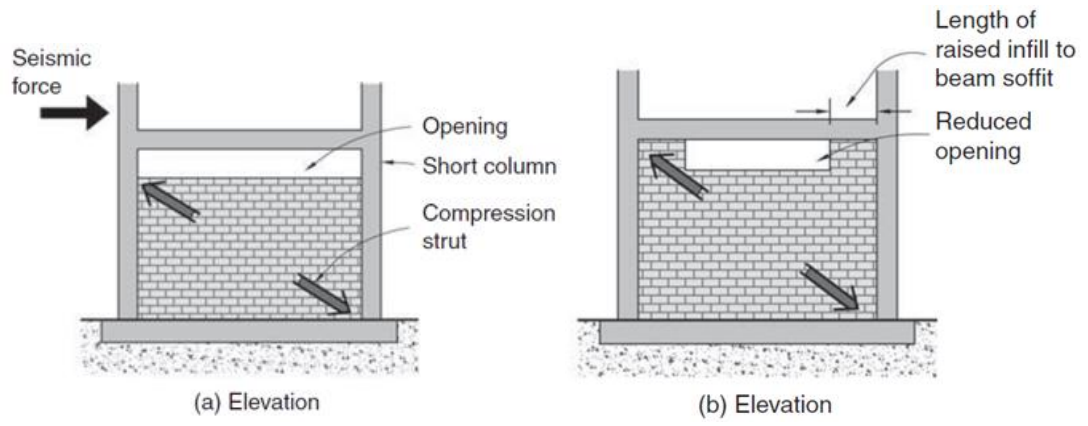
A Method of Avoiding Short Columns (Charleston, 2008)
